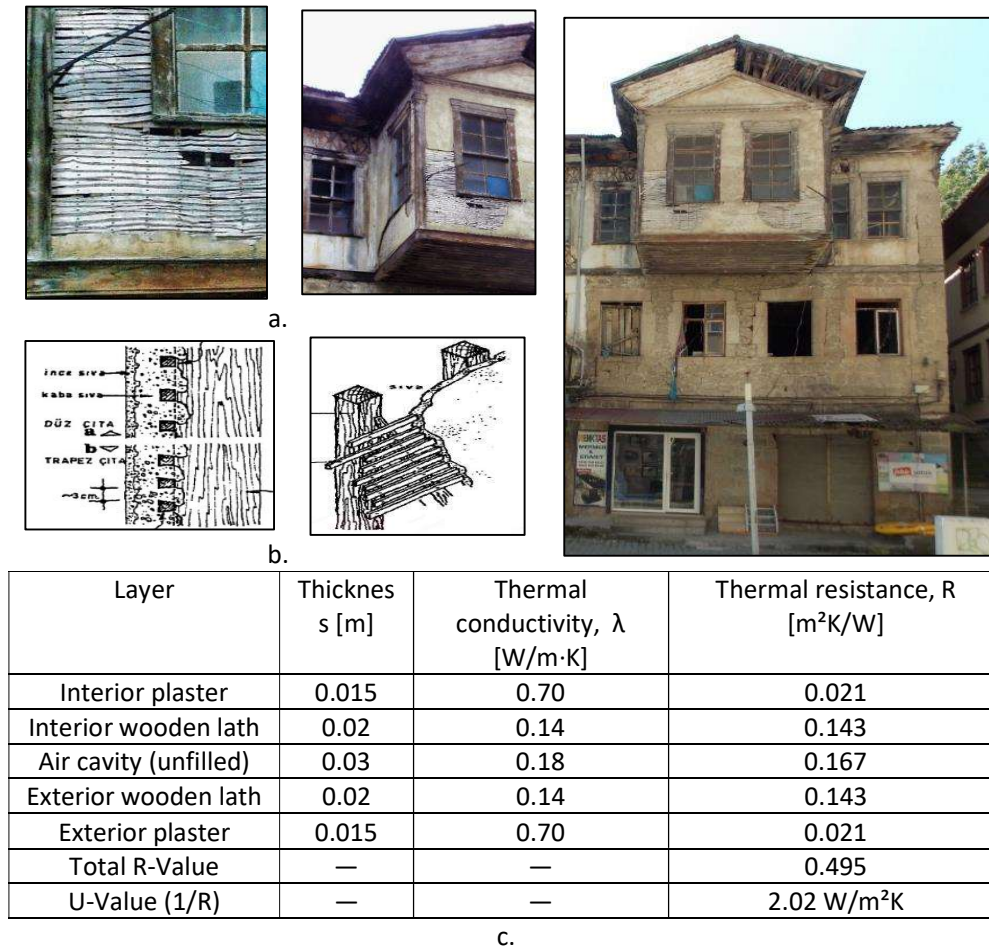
Timber-frame and board-infill configuration of the *bağdadi* wall system (Selected building from *Çarşı*): a. photographs of wall junction details (Author, 2024); b. technical drawing of wall connections [5]; c. layered wall section and calculation of thermal transmittance resistance
